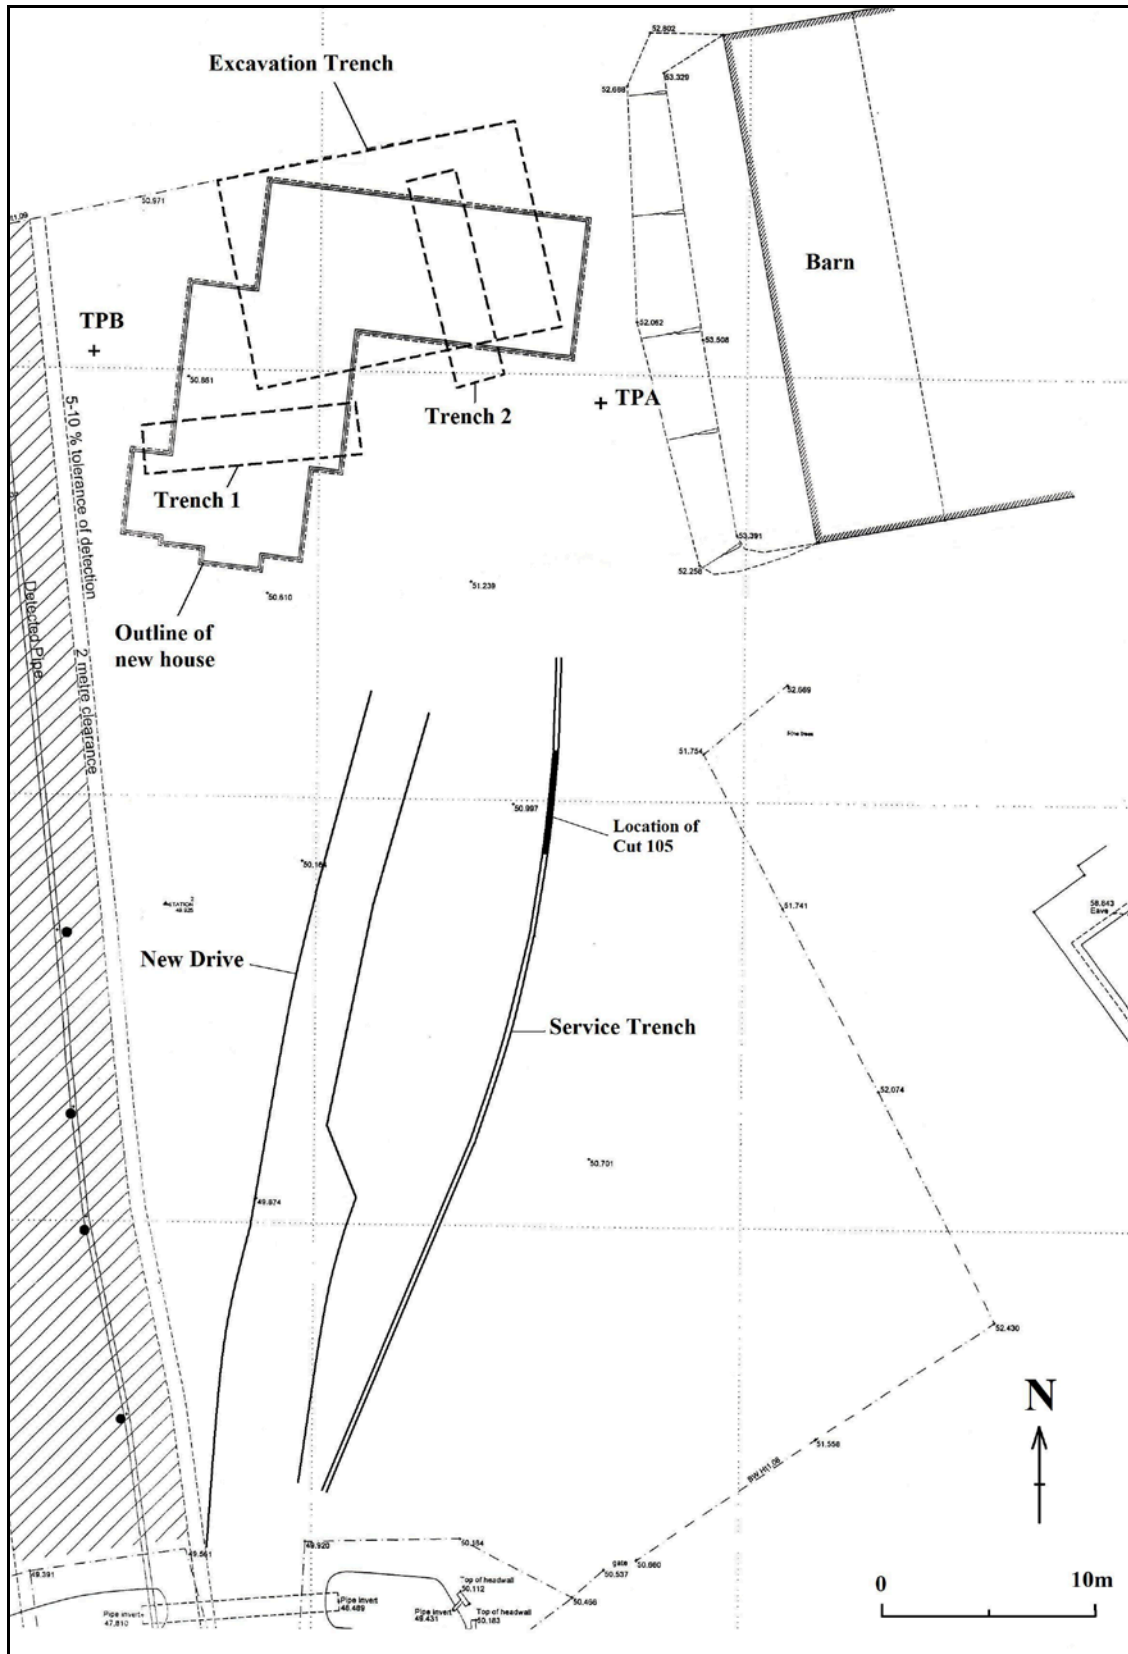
Itford Farm: Site Plan showing the location of the trenches test pits, drive and service trench.
